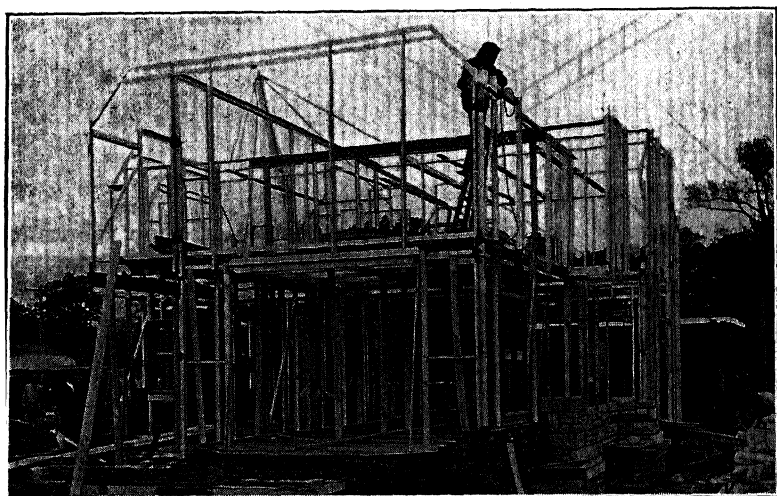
Field welding of steel frame of 12-room residence.
